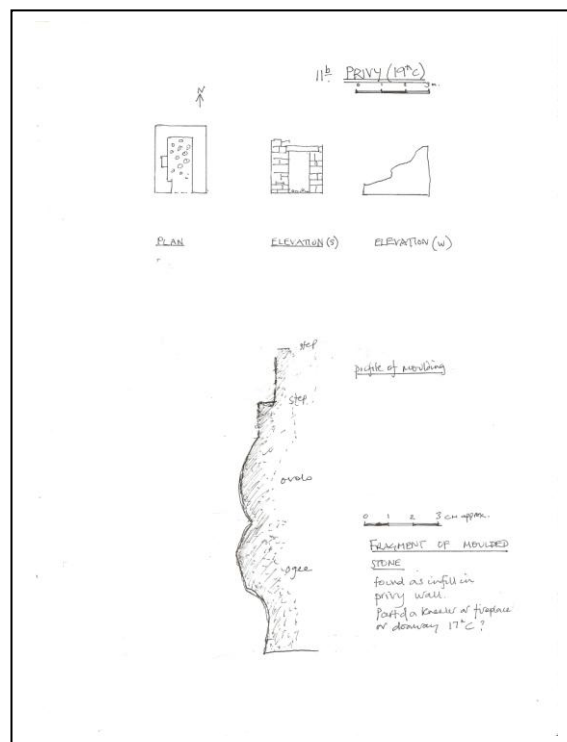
Thorns 11b, plan, elevation and moulding
